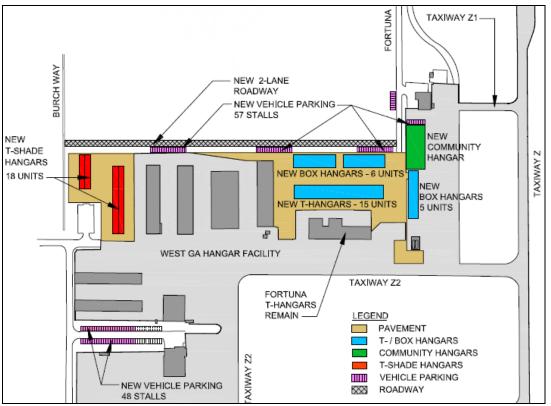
FBO and GA Facilities Development, GA Facilities Expansion, Alternative 2
